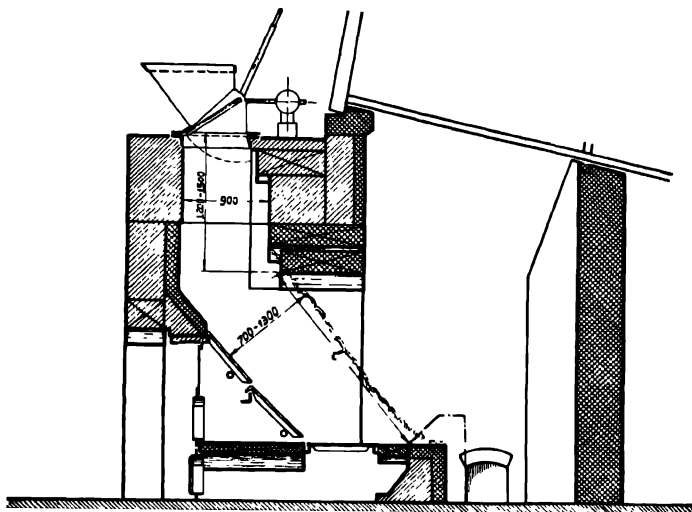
Firewood shaft furnace with inclined combustion surface.
